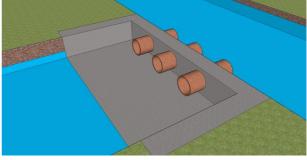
Pipe through earth wall (source: home.kpn.nl)
